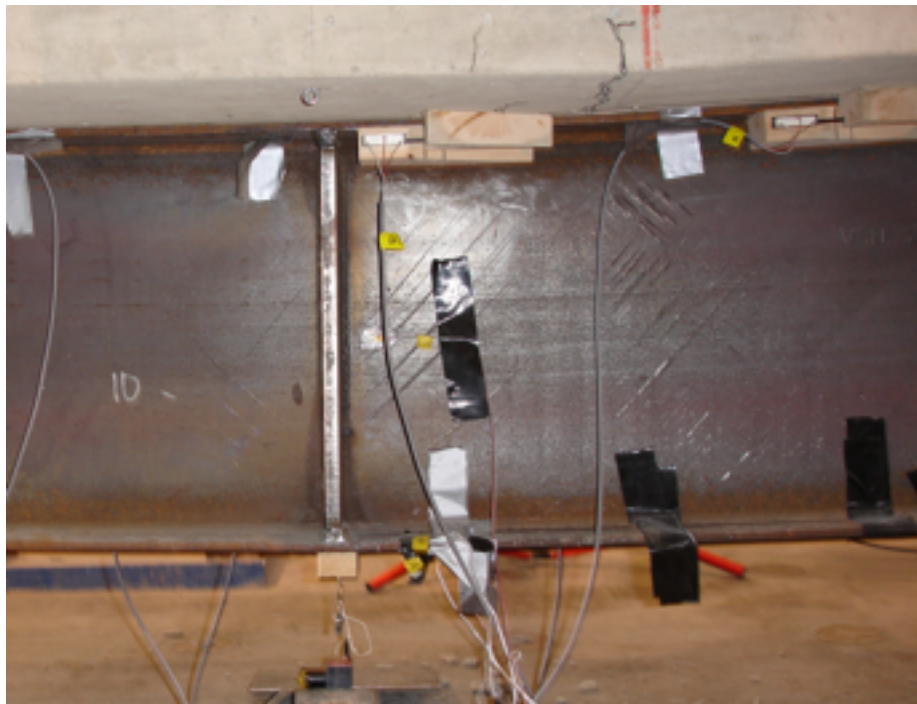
Tension cracks forming in the bottom side of the concrete deck at midspan
